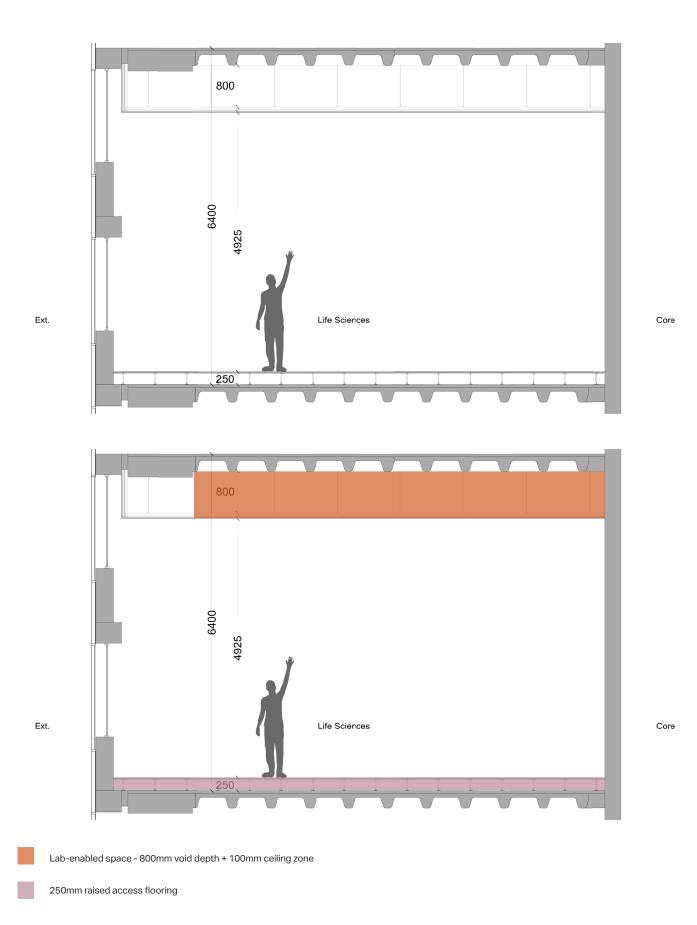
Floor sections for lab levels which gives the clearest floor to ceiling height while delivering modern building services and tenant flexibility.
